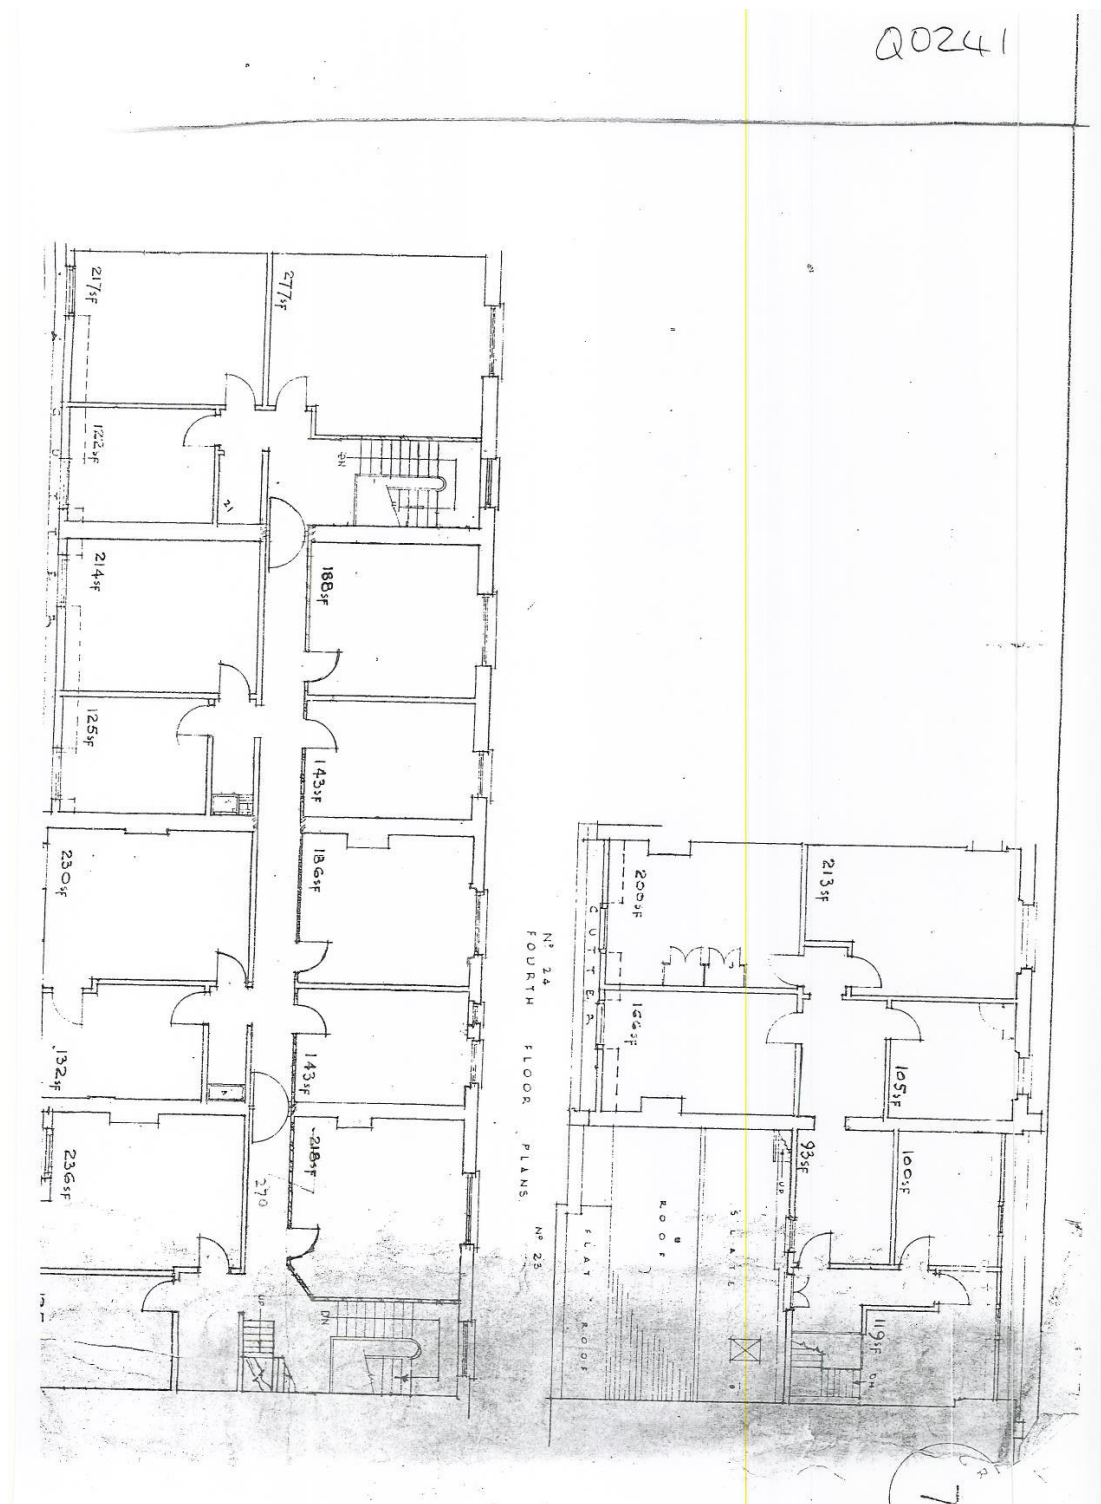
Extract from Ministry of Works Plans April 1946 Fourth Floor Plans Nos: 24 – 23 Chester Terrace – The Crown Estate Archives
